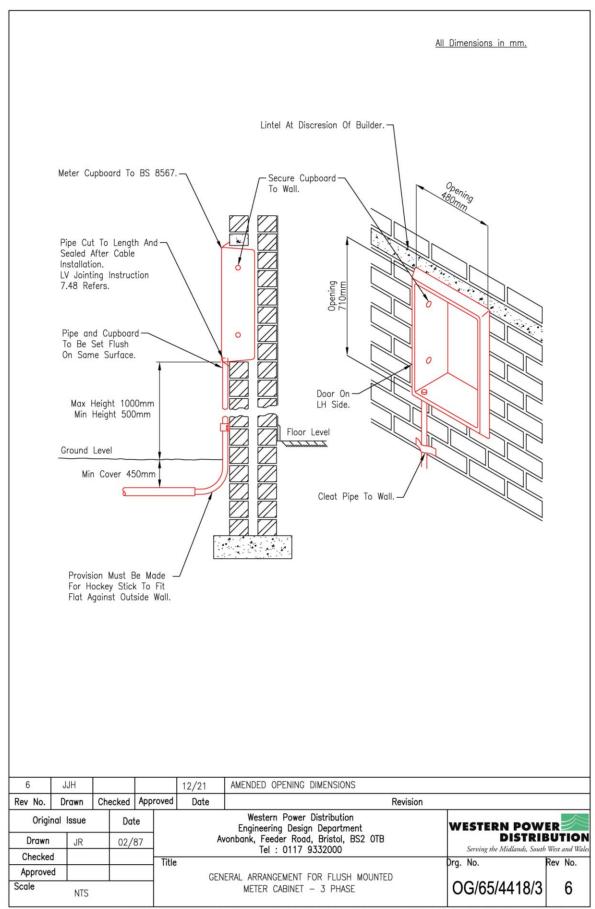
Drawing Number OG/65/4418/3 Flush mounted meter cabinet – 3 phase
